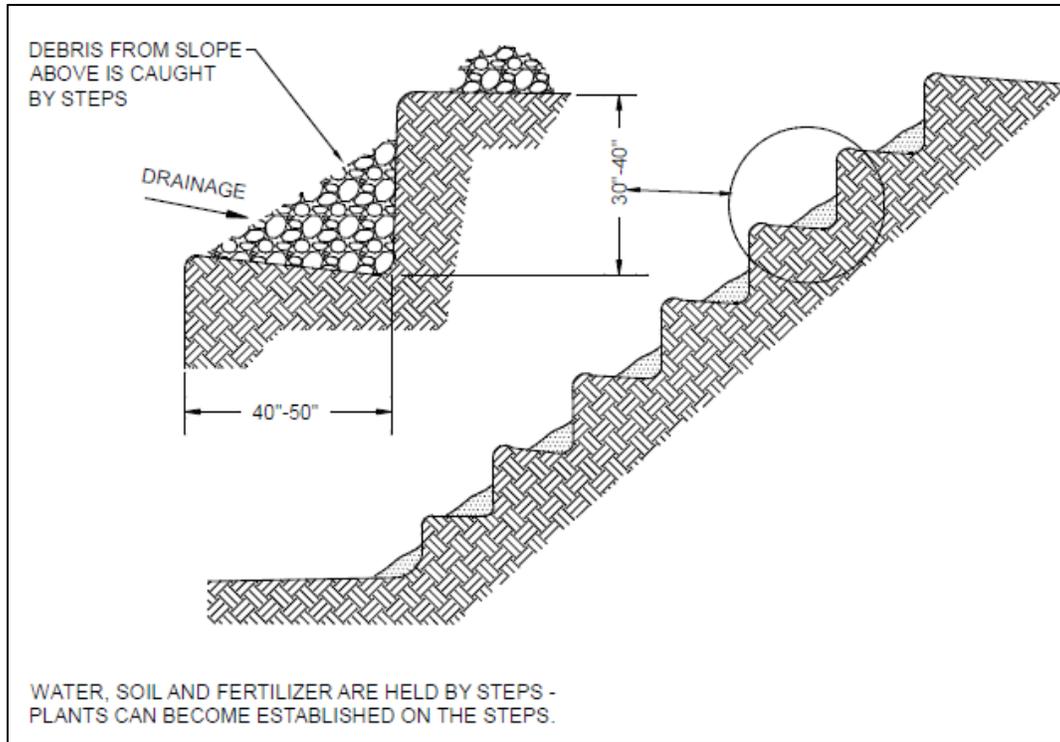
A: Benching details. Adapted from VDEQ (2024).
